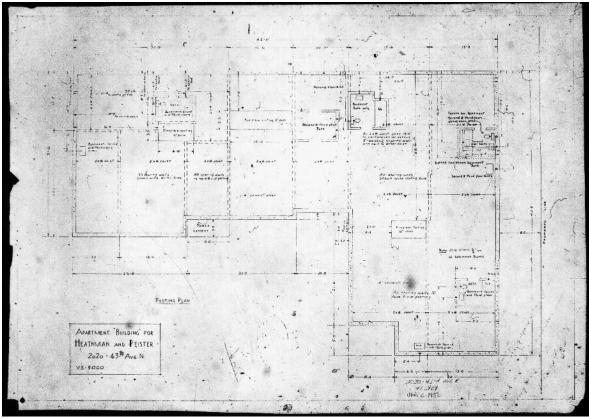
"Apartment Building for Heathman and Peister 2020 43rd Ave. N. [Building Permit] 412969 Mar. 6 1952" Footing Plan
